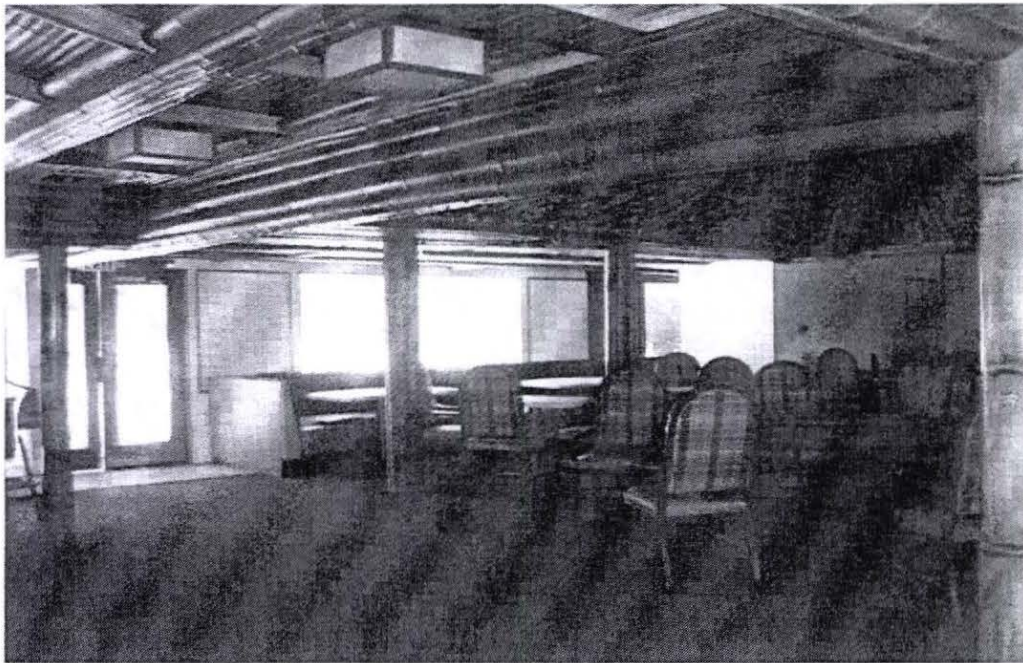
Building "B"- Bamboo Lounge/ Pro Shop
